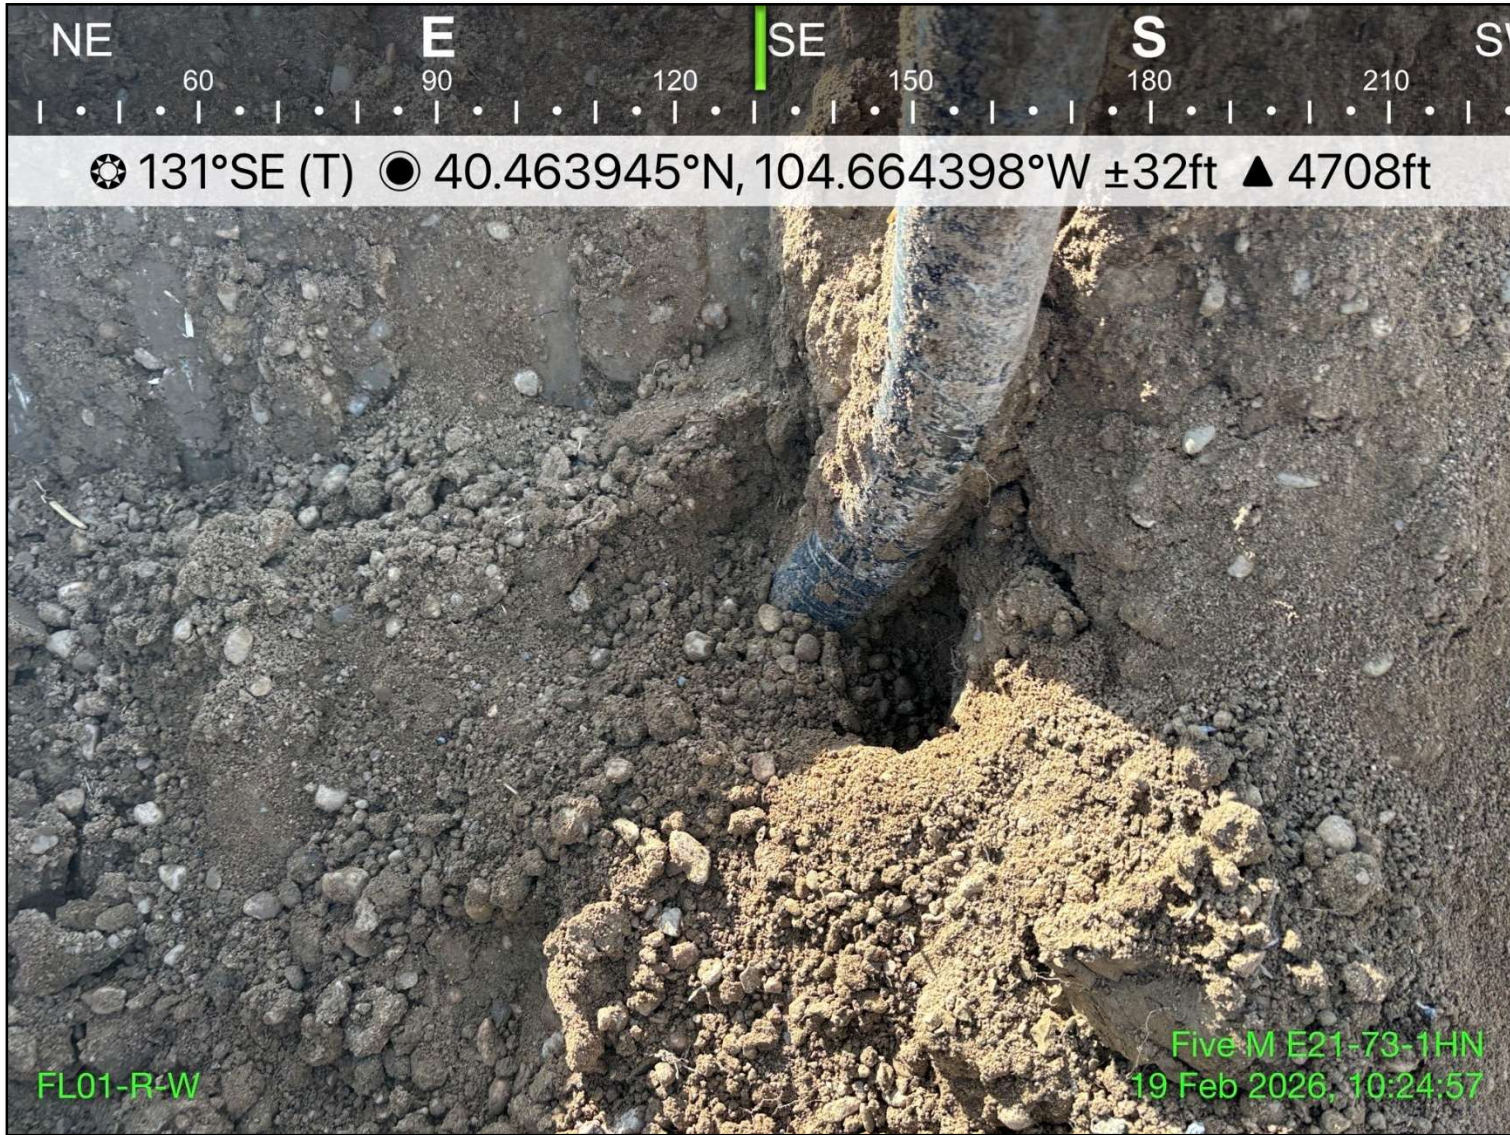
View of FL01-R-W sample location inside wellhead excavation extent, facing southeast
